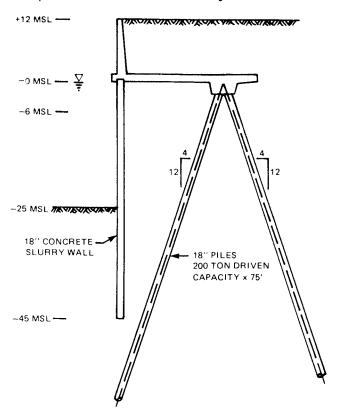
Bulkhead Design - Use of battered piles and relieving platform to resist liquefaction.
